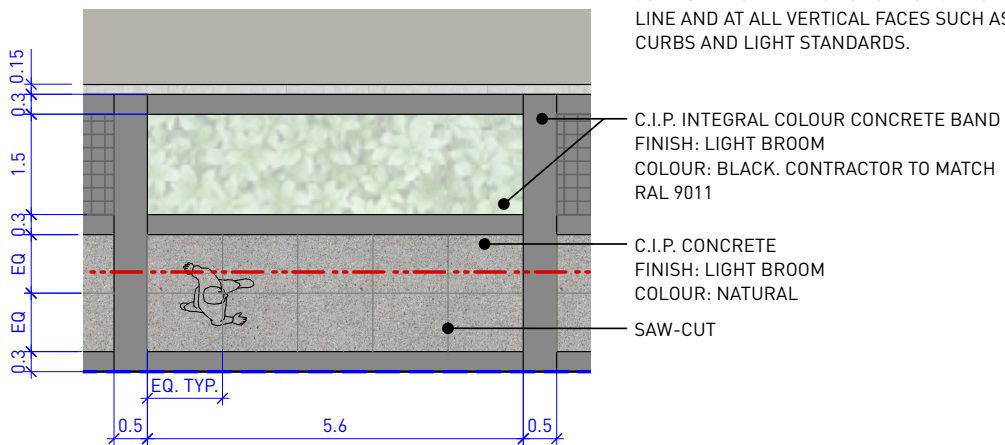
ENLARGEMENT 4 - PAVING AROUND PLANTER
